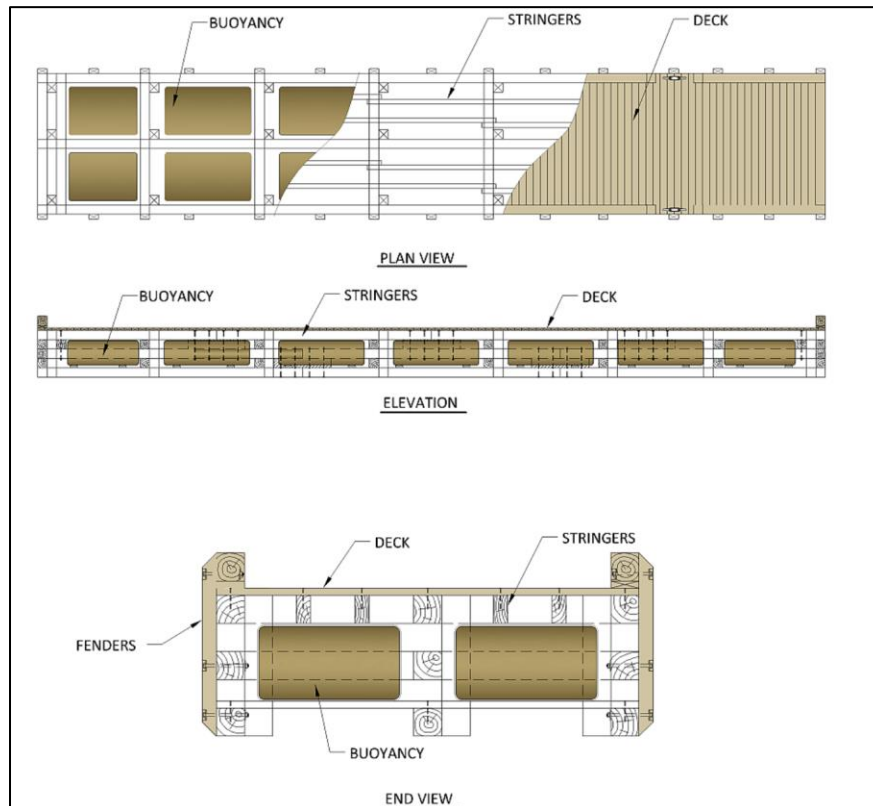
Typical Floats Plan view, Elevation, and End View (Ref. *Canadian SCH Design Guideline*)
